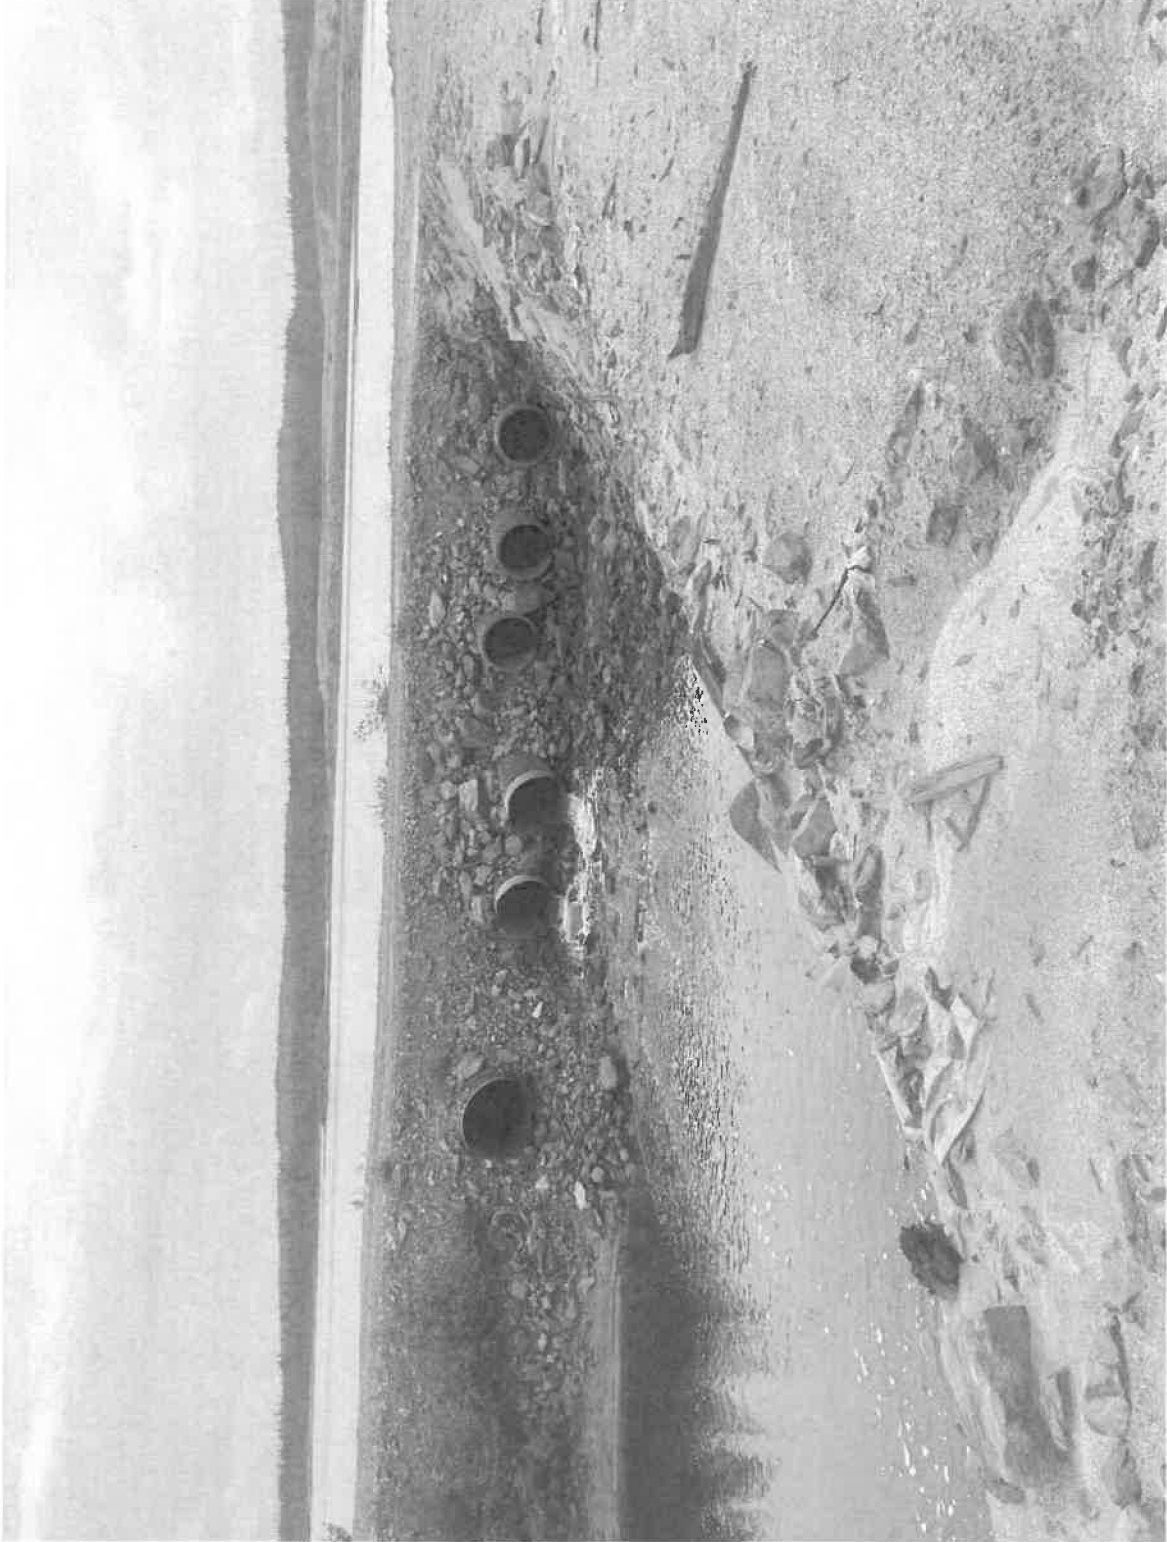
Photo of the 6 culverts to be replaced. (England's Steady in background)
